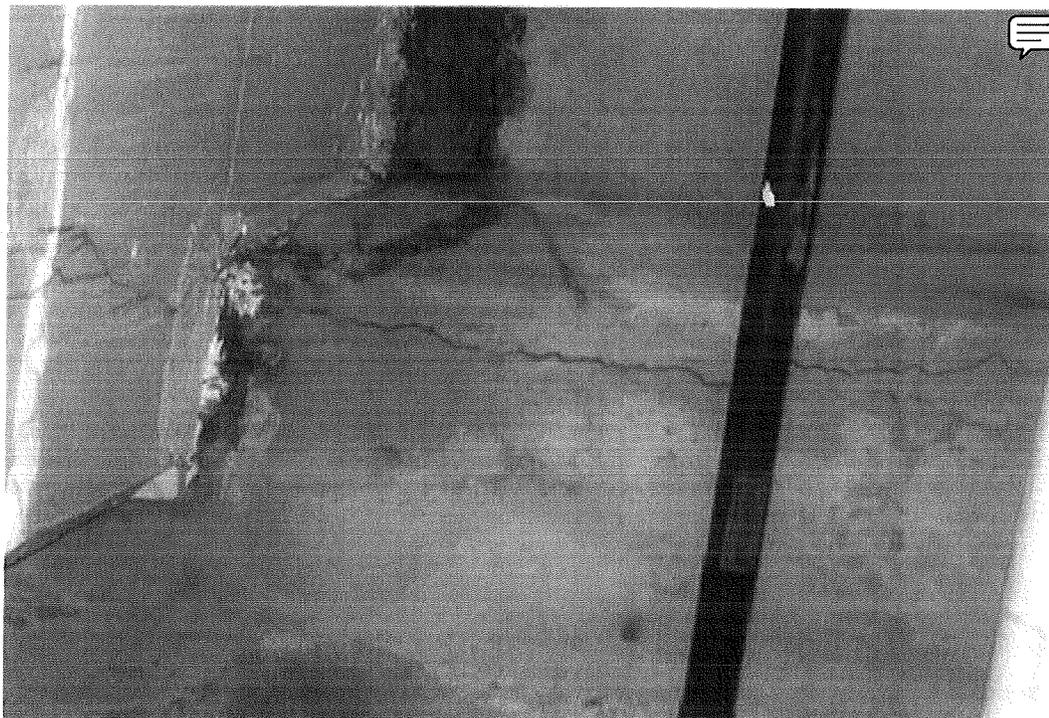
Cracked and hollow sounding encasement. Underside of Sixth Floor, at Column Line 13/U0. (Approx. 3 SF)
